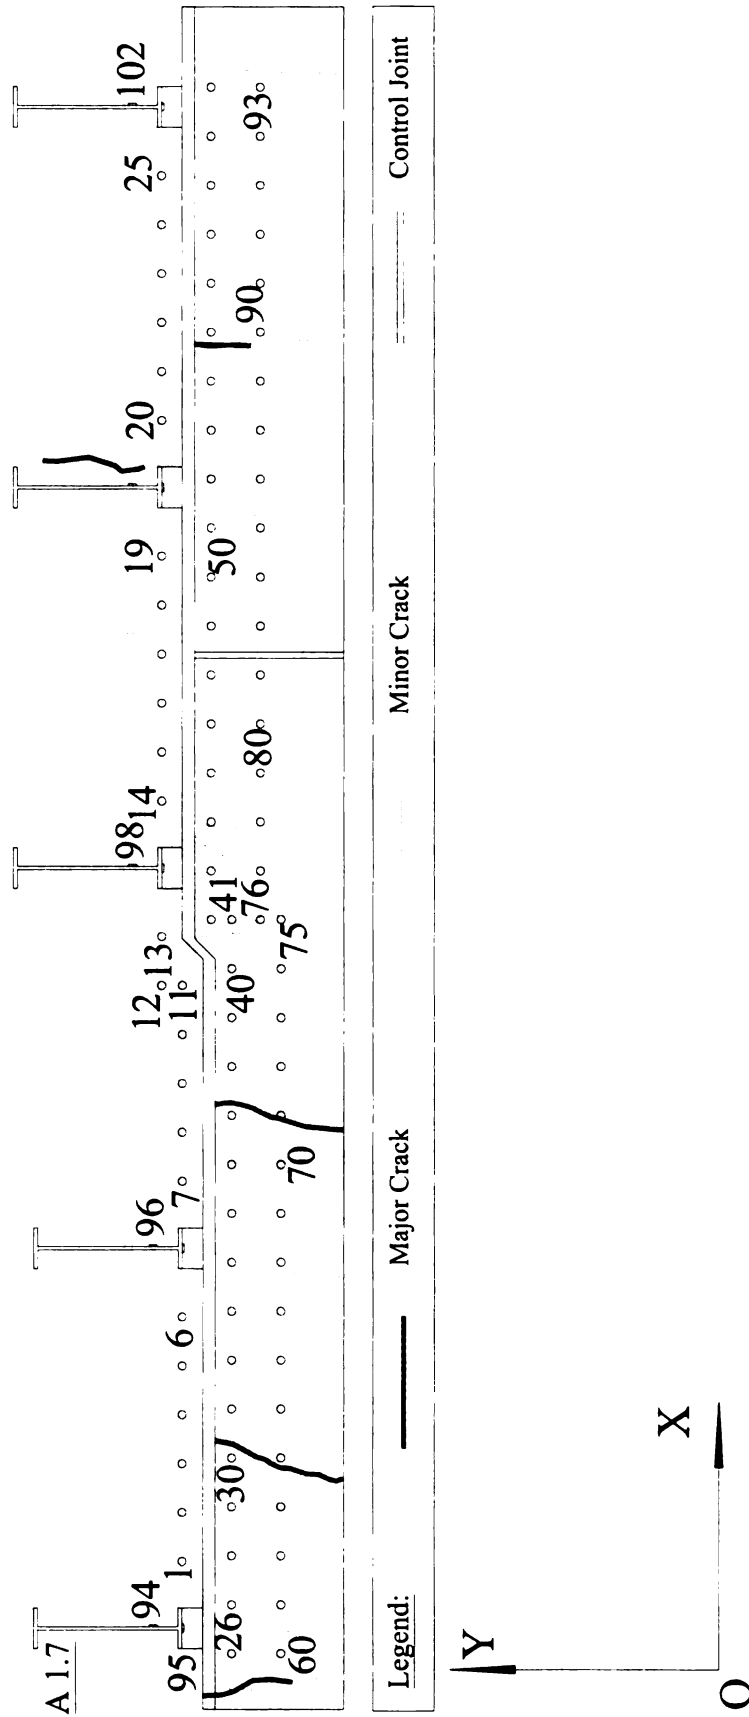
Deployment of measuring points on half of the abutment wall of bridge A1.7
